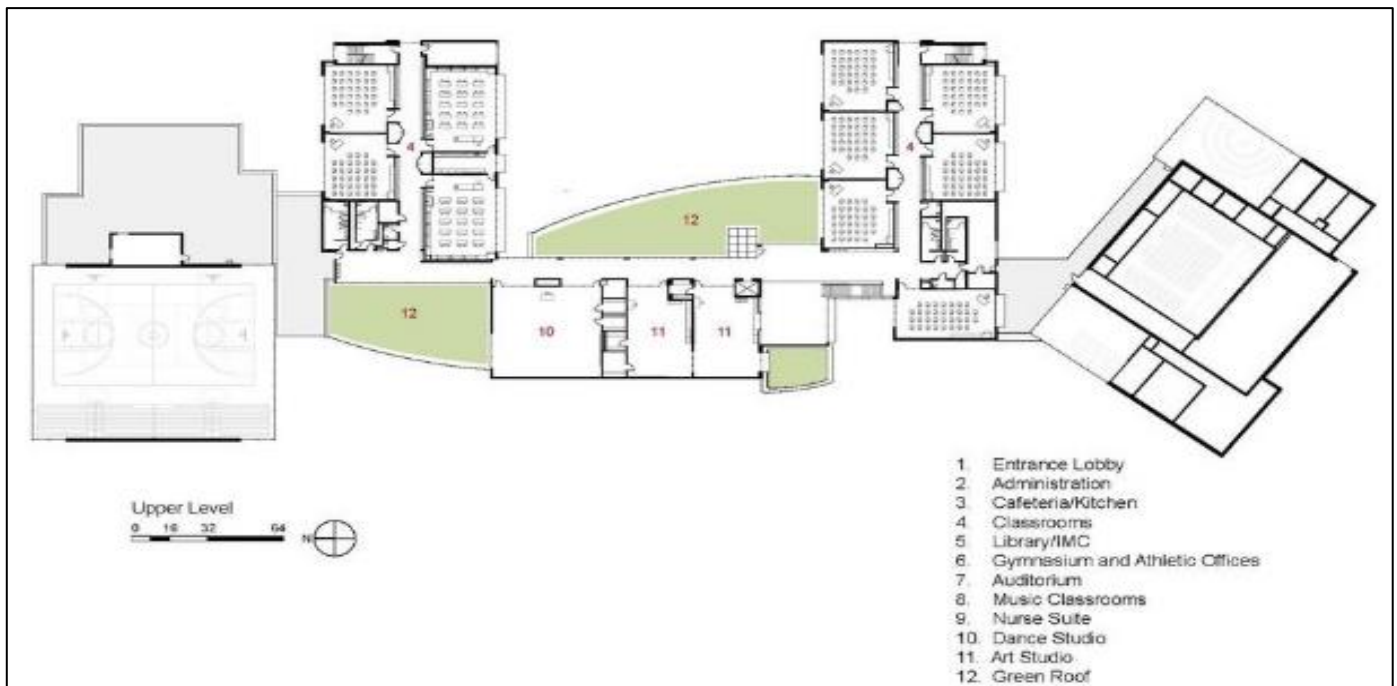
U- Shaped Plan of the Campus Enhance Daylight in Buildings - Credit: Second Floor Plan - Photo Credit: SMP Architects
